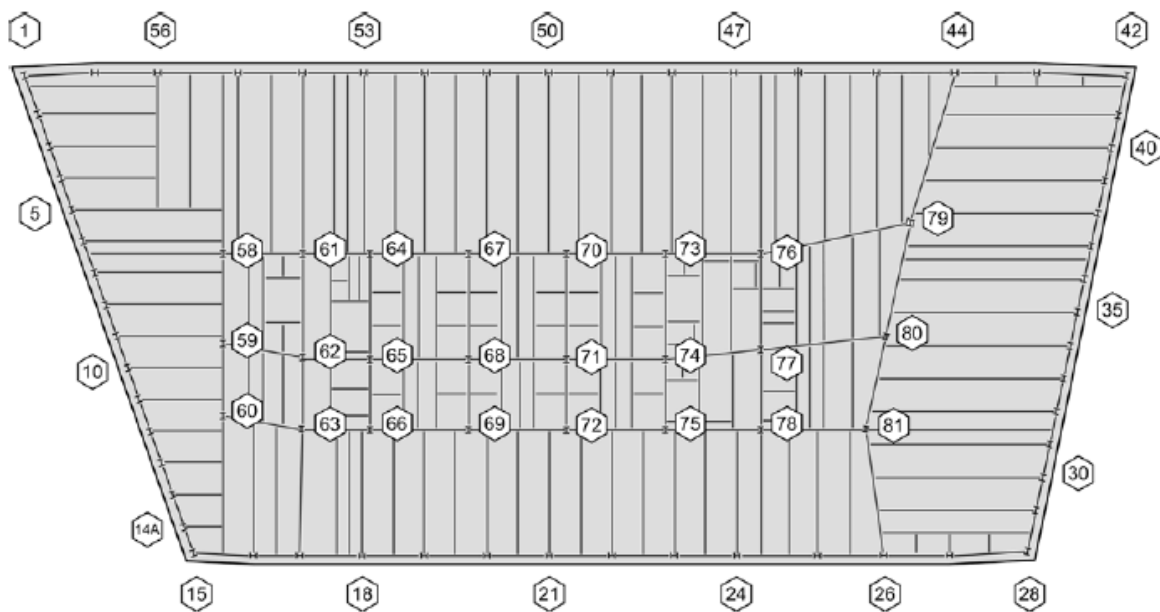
Typical floor plan of WTC building 7 (NIST, 2008)
